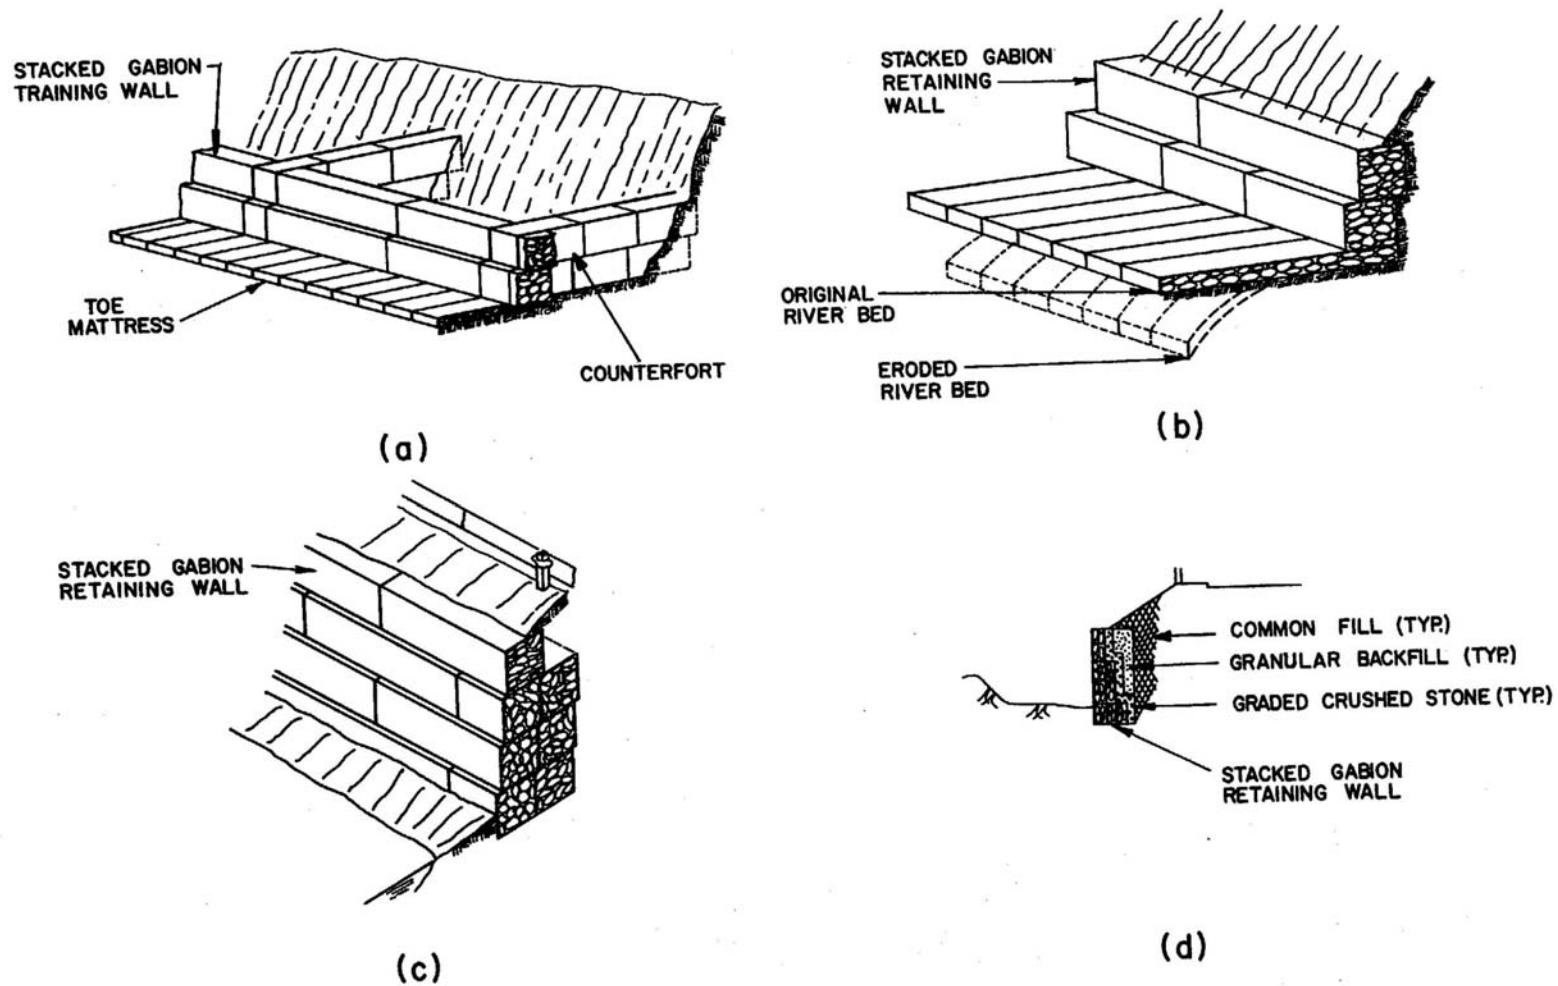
Typical stacked block gabion revetment details: (a) training wall with counterforts; (b) stepped back low retaining wall with apron; (c) high retaining wall, stepped-back configuration; (d) high retaining wall, batter type (after [Brown and Clyde, 1989](#)).
